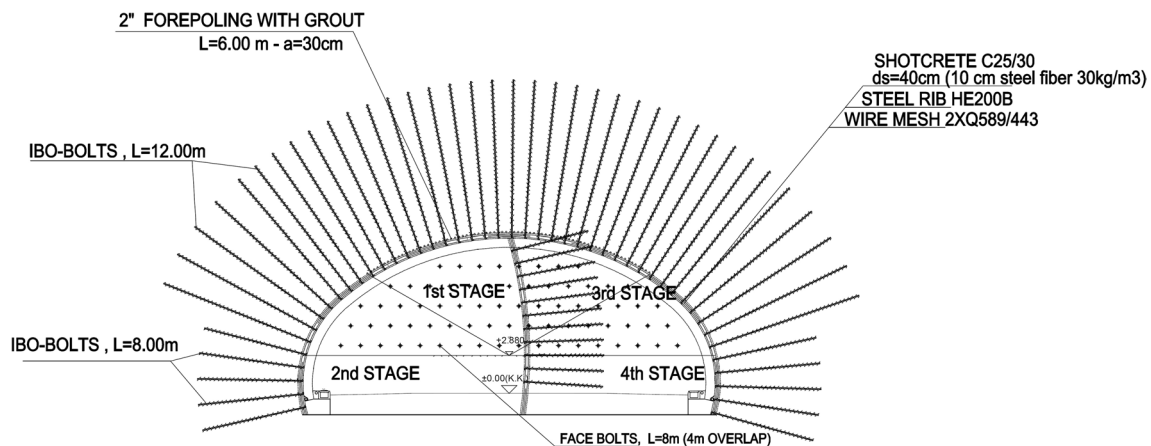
Details of tunnel support class between Km:0 + 063.98-0 + 174.90 [20]
